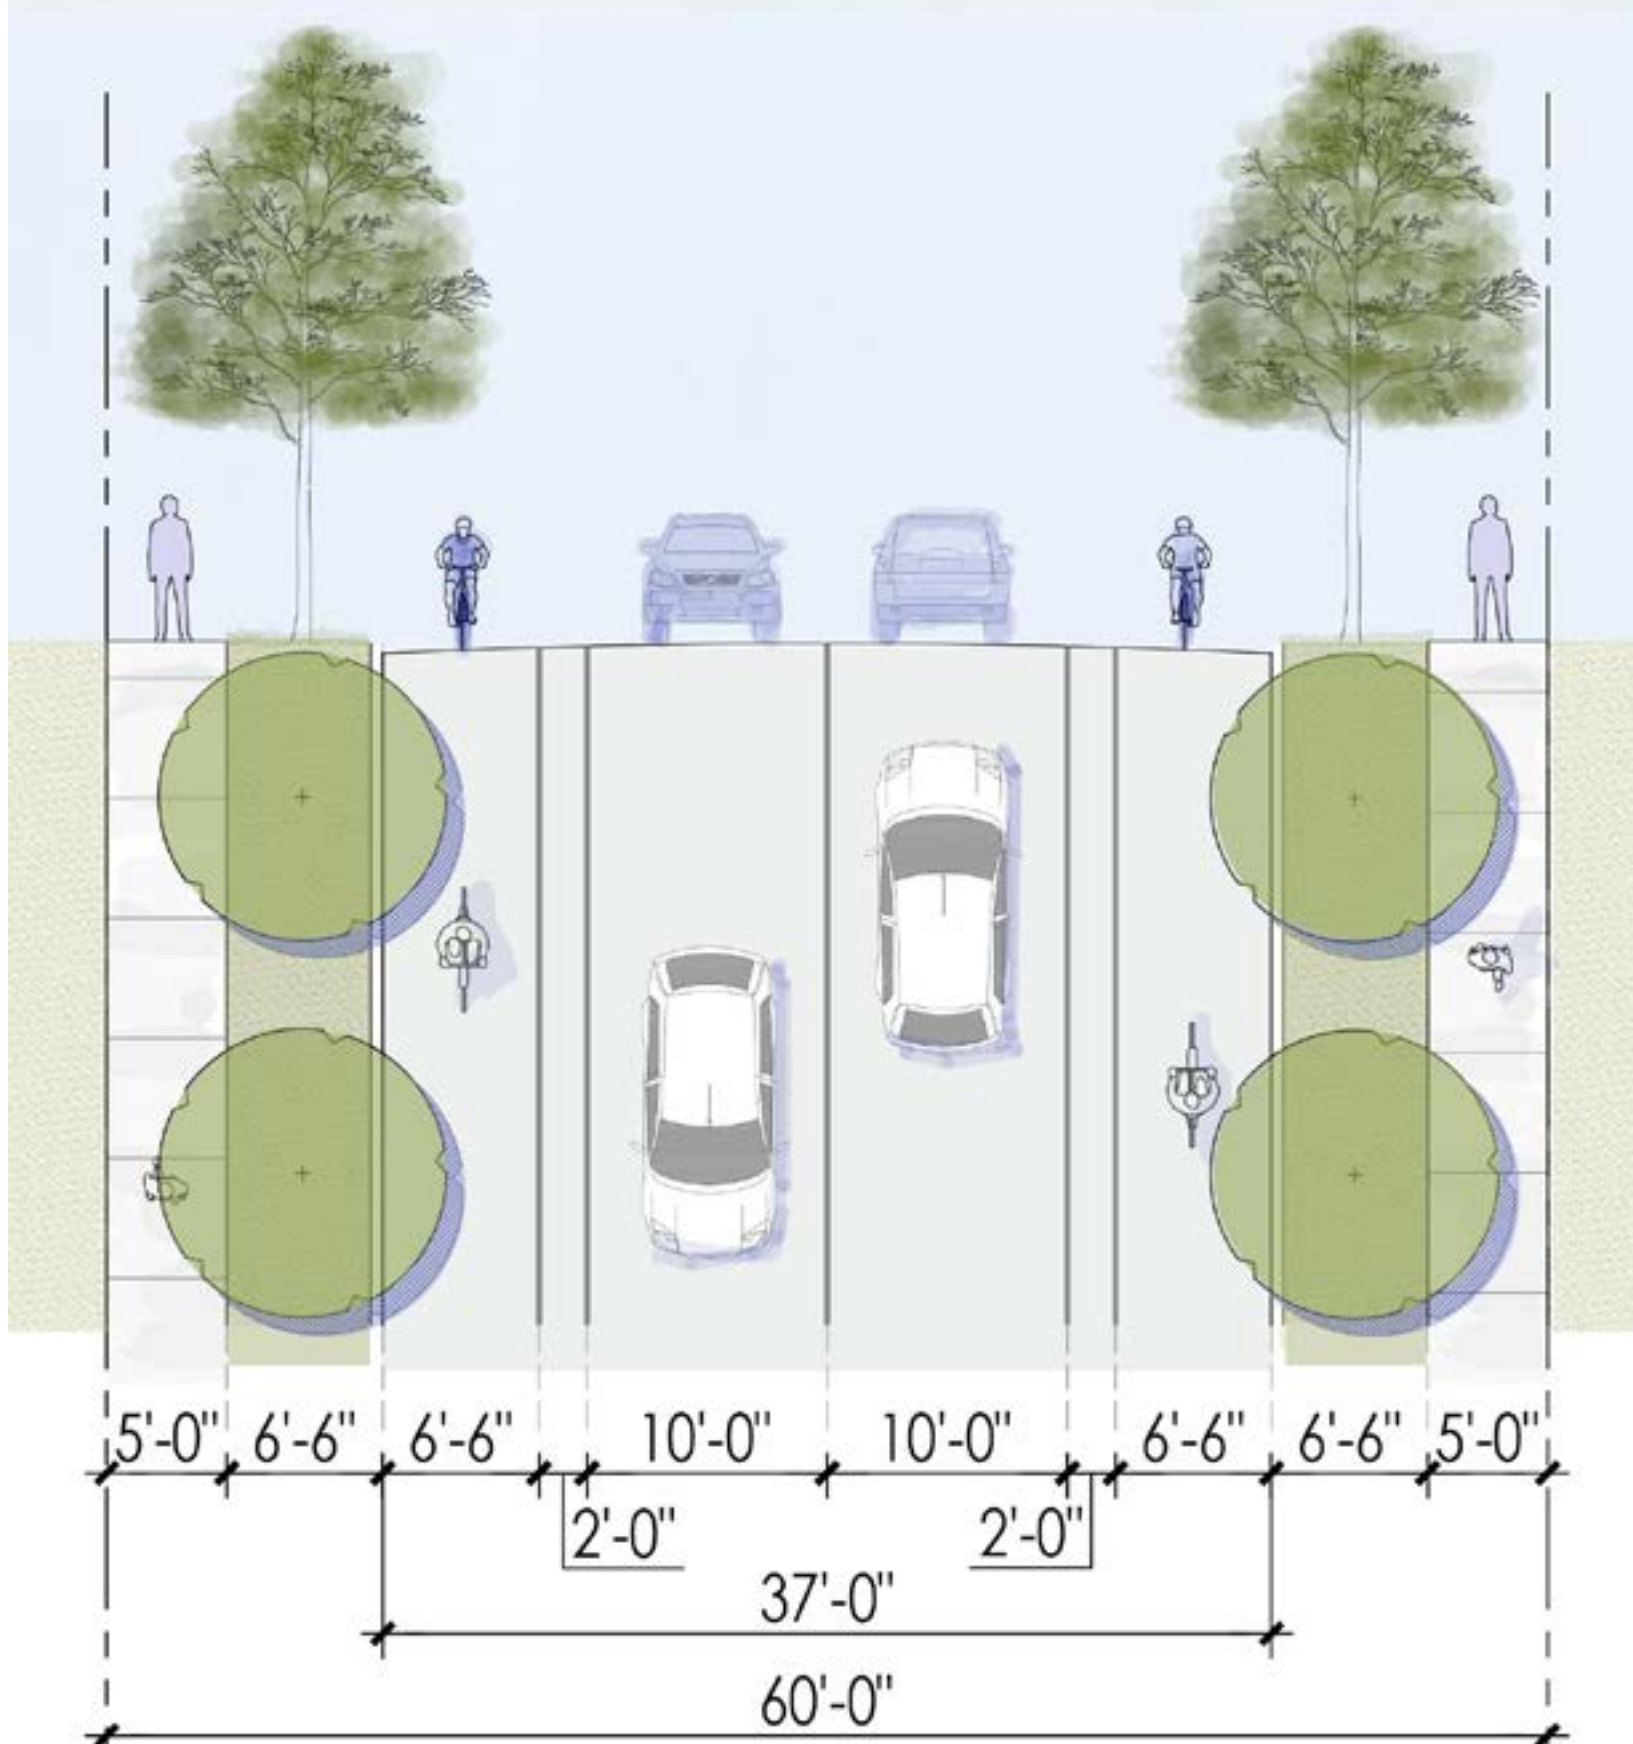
# EXHIBIT L - DEPICTION OF RIGHT-OF-WAY DEDICATIONS AND SUBDIVISION STREET CROSS-SECTIONS
